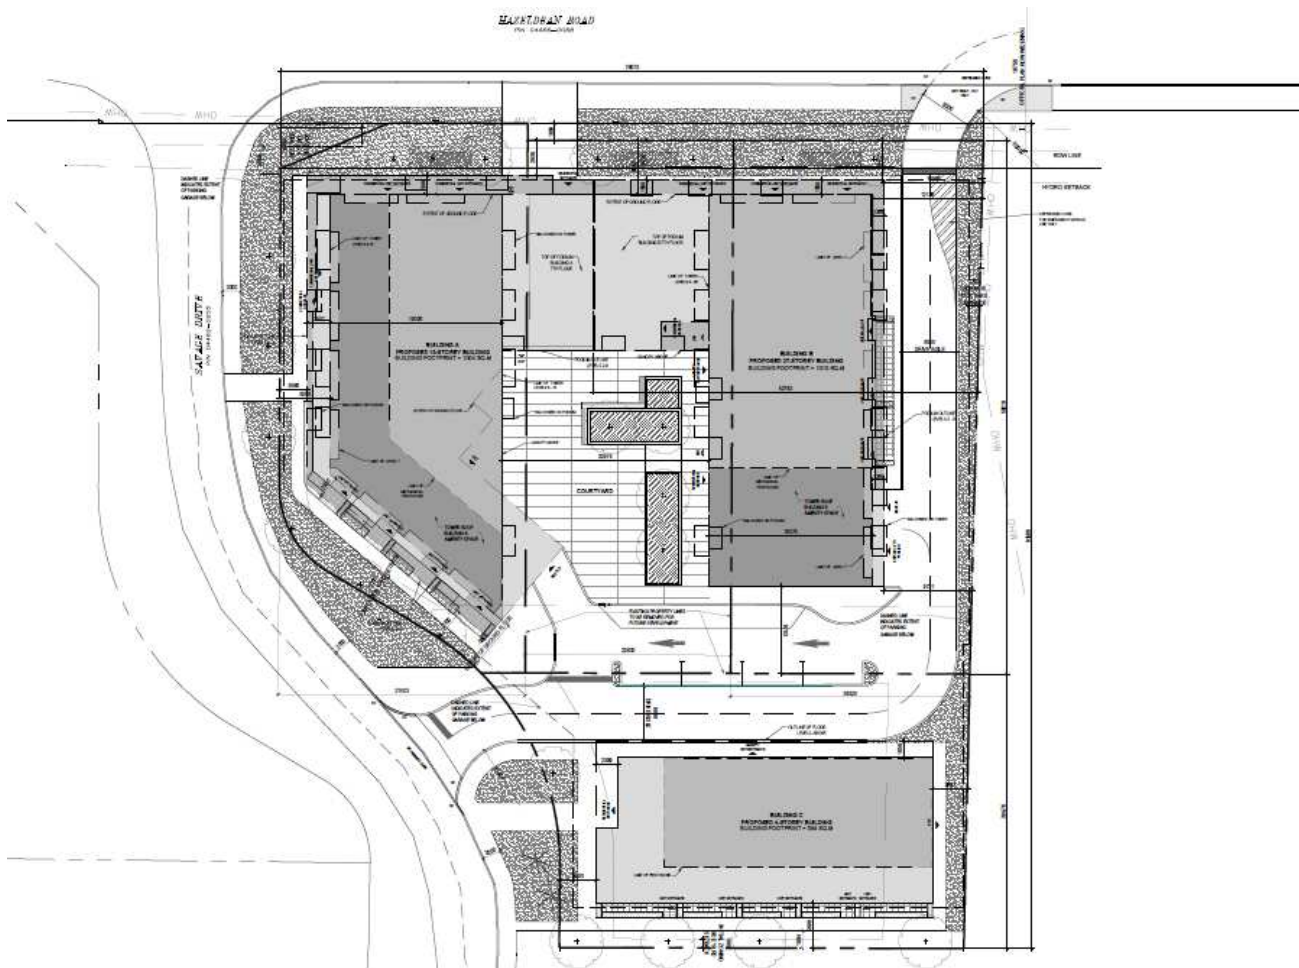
Excerpt of the current Site Plan (Source: Figurr Architects Collective)
